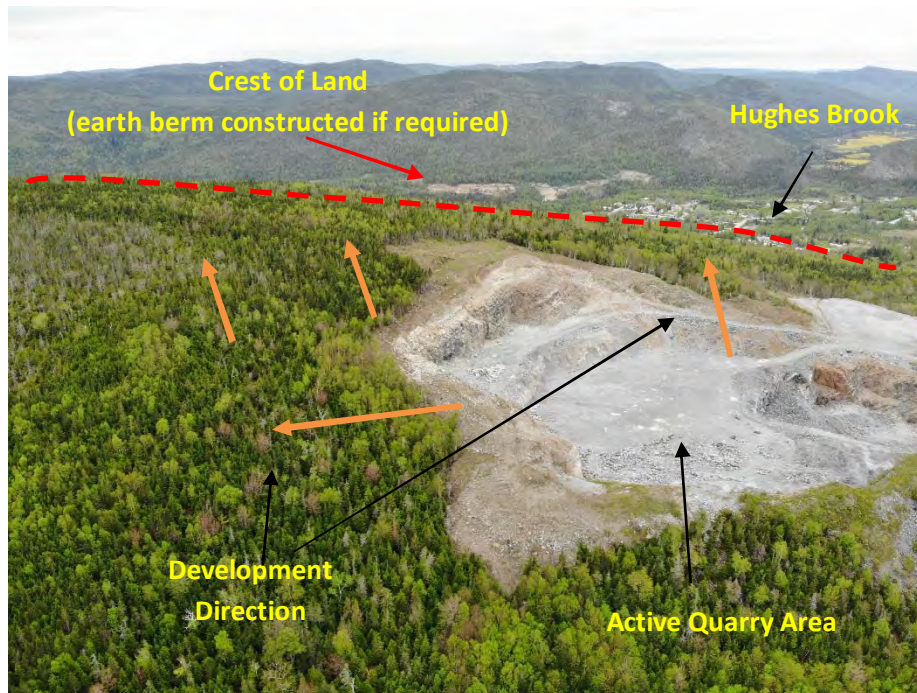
Drone Photo Looking North (at ~70 m above ground level)
